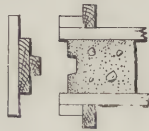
Method of joining foundation walls where it is necessary to leave an expansion joint, or where concreting has been discontinued for any reason.
